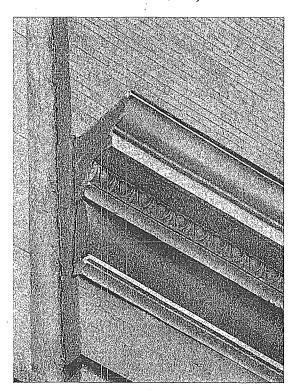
Detail photograph of water table banding at the third floor. Note minor spot corrosion bleeding through the paint (photograph taken on 01/26/2018).
